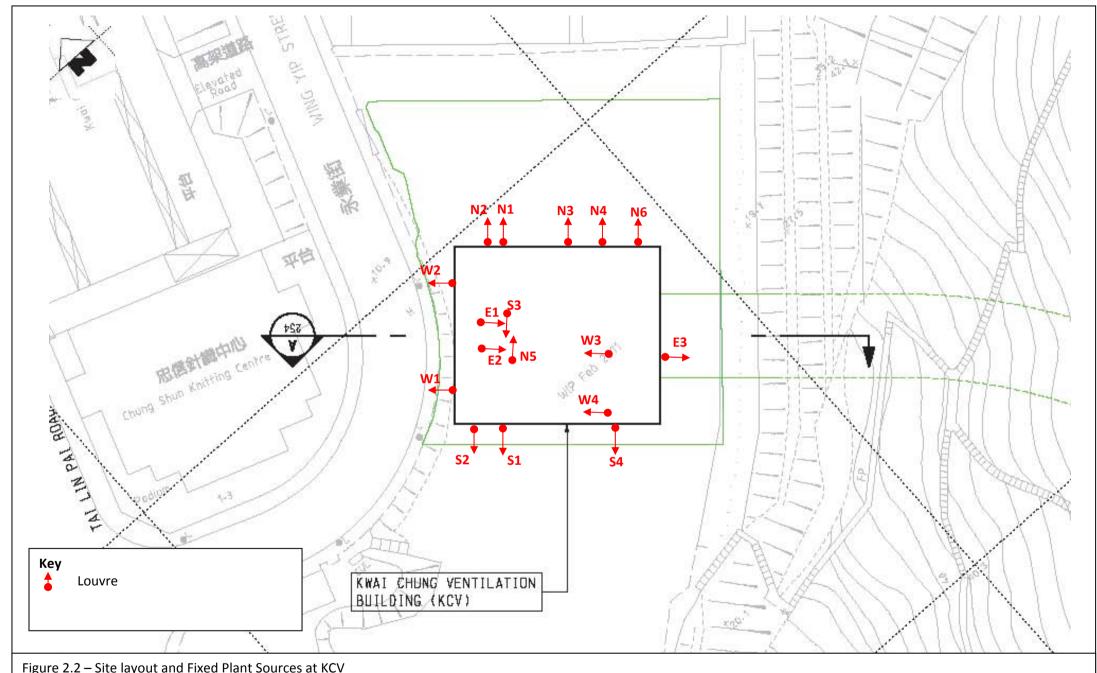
Site layout and Fixed Plant Sources at KCV
